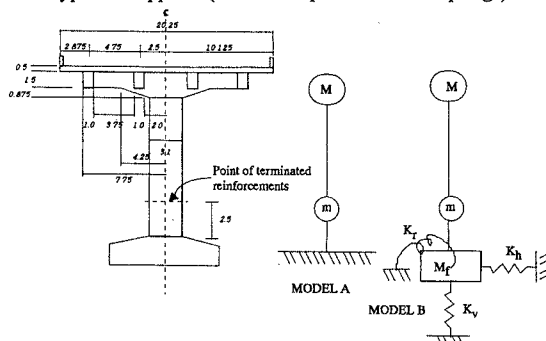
ANALYTICAL MODELS OF BRIDGE PIER
